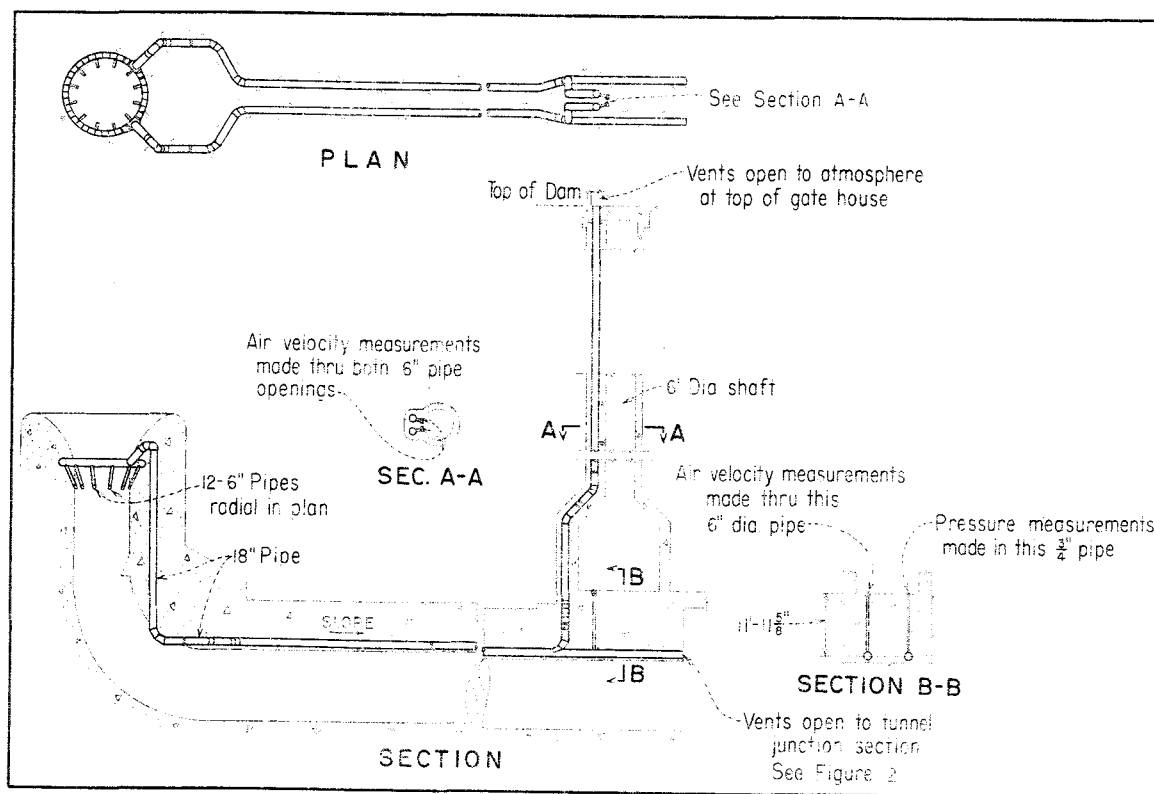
Spillway air vent system at Heart Butte Dam.
